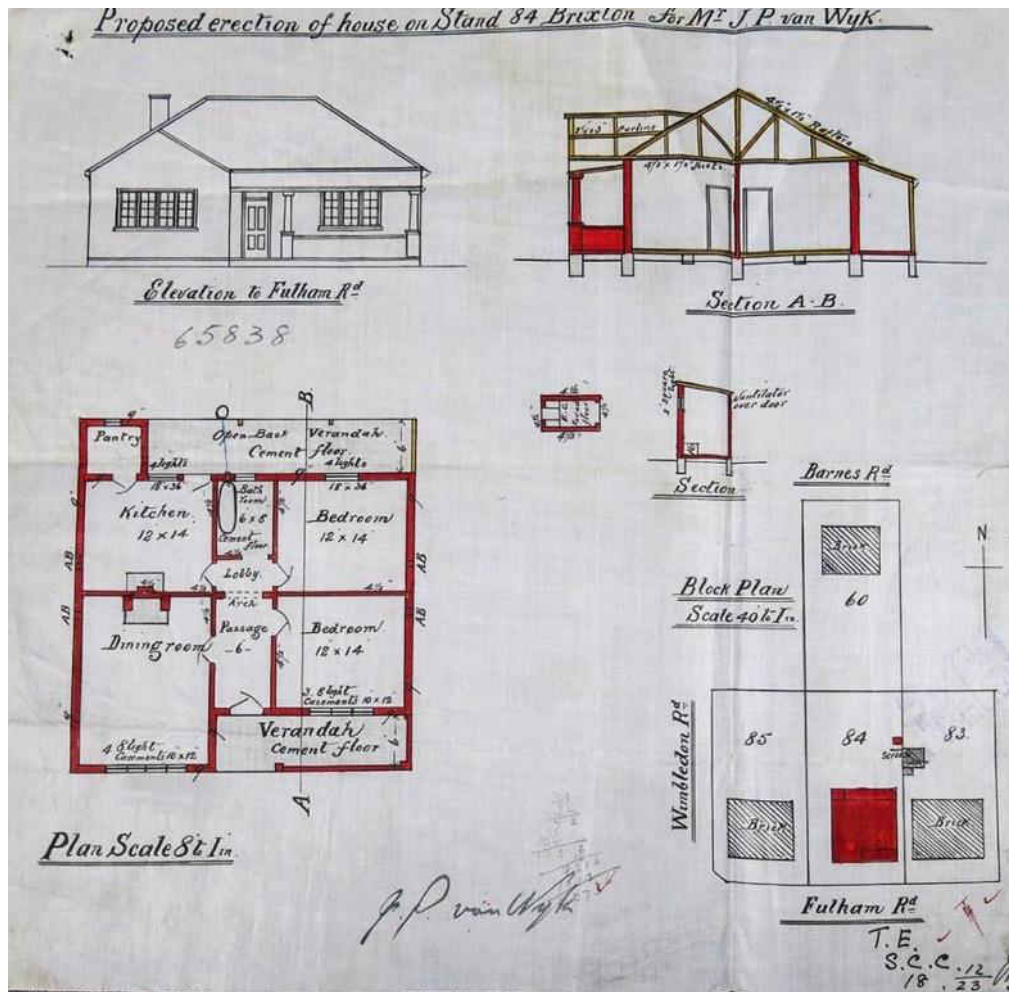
Proposed erection of house on Stand 84 from 1923
